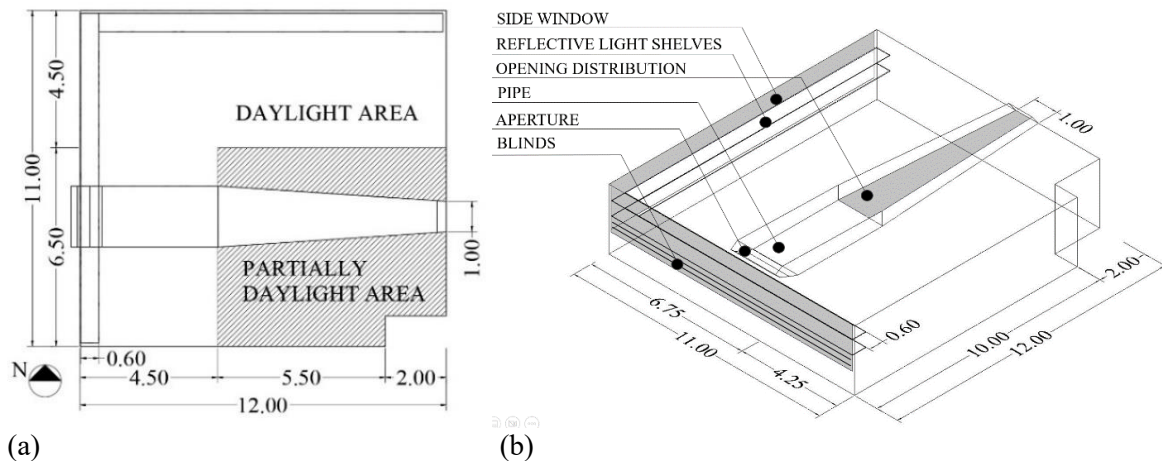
(a) Plan and (b) Perspective of an office room with bilateral opening integrating horizontal light pipe, light shelves, and blinds
